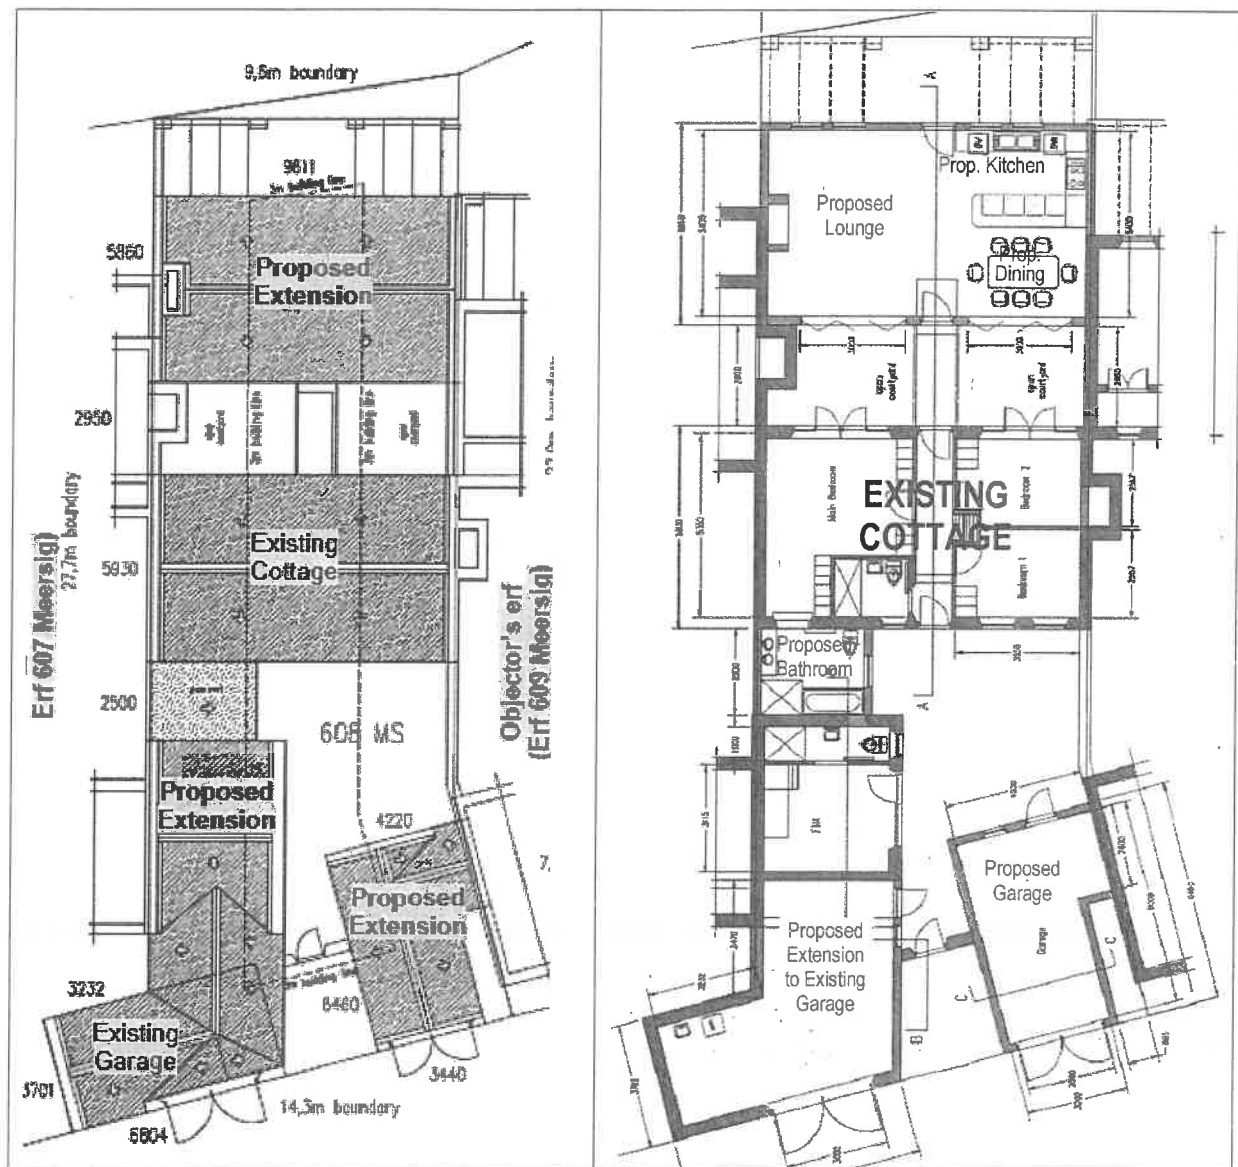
Proposed Extensions to the Cottage on Erf 608 Meersig
